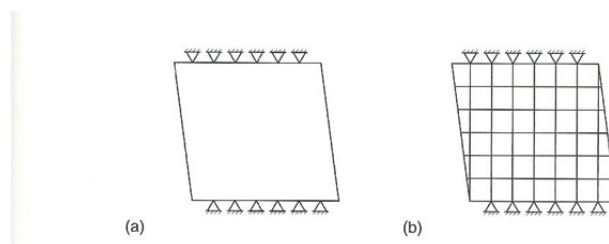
Grillage Mesh for Short and Wide Bridge Decks with Small Skew (a) Plan View, (b) Grillage Layout (O'Brien & Keogh, 1999) Used under fair use, 2013
